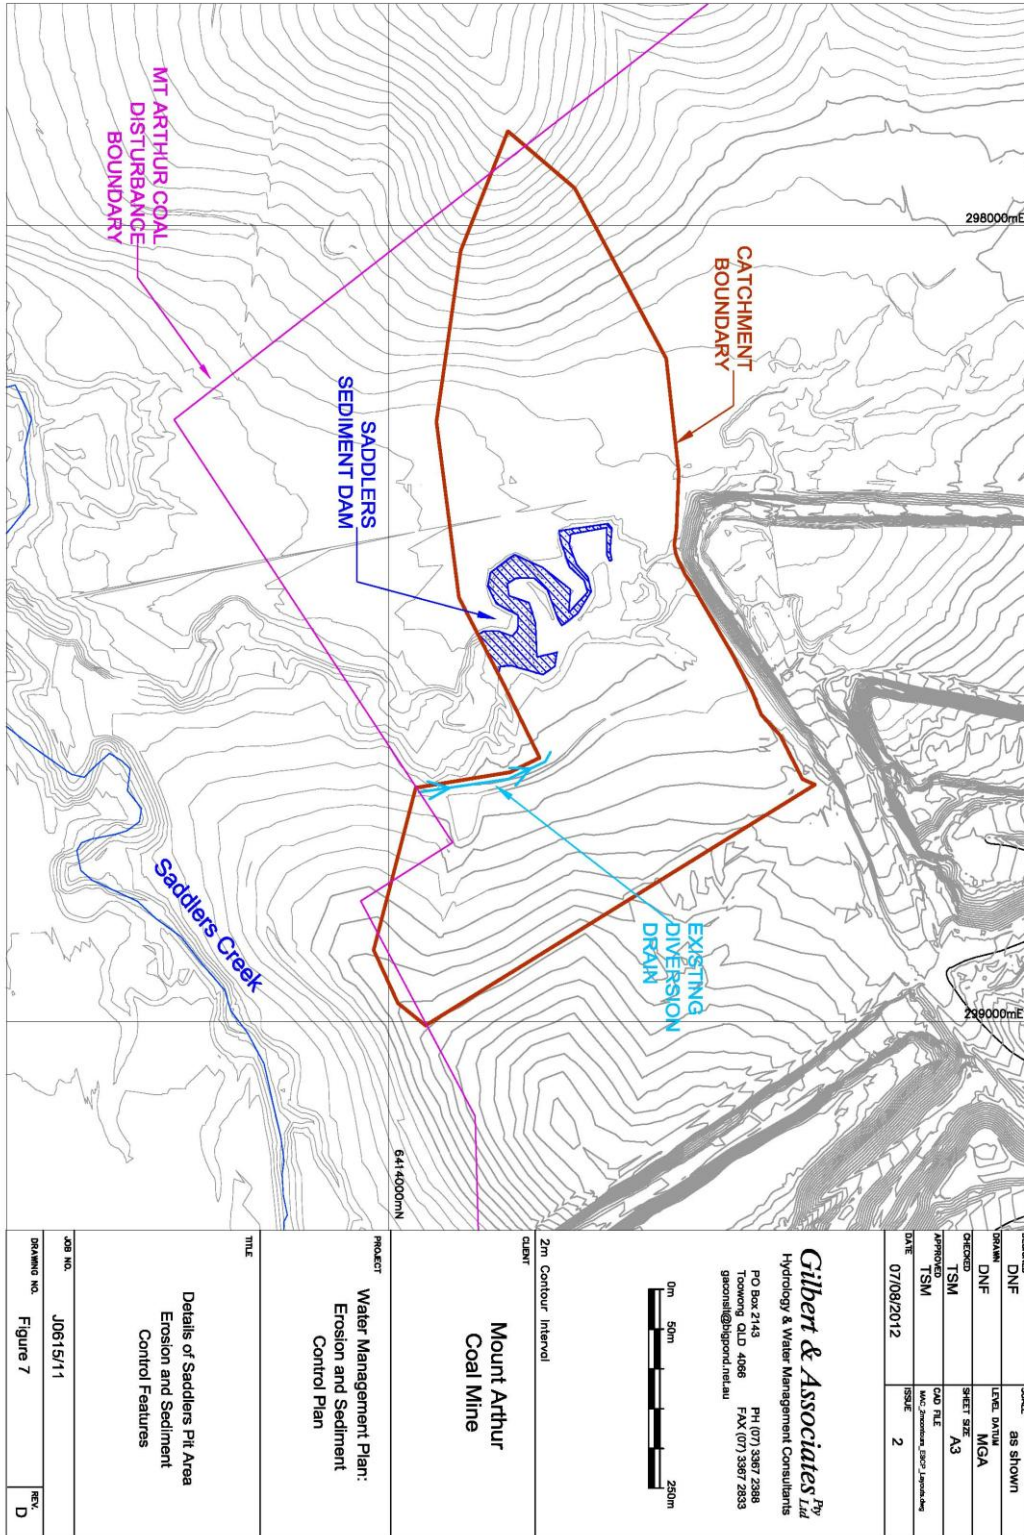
Detail of Saddlers Pit Erosion and Sediment Control Features
